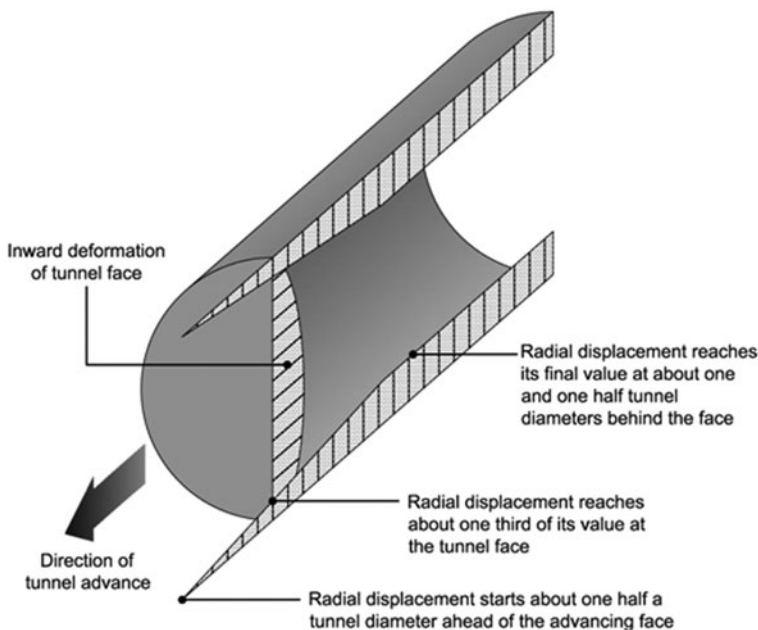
Pattern of radial deformation in the roof and floor of an advancing tunnel. (Hoek 2013)
